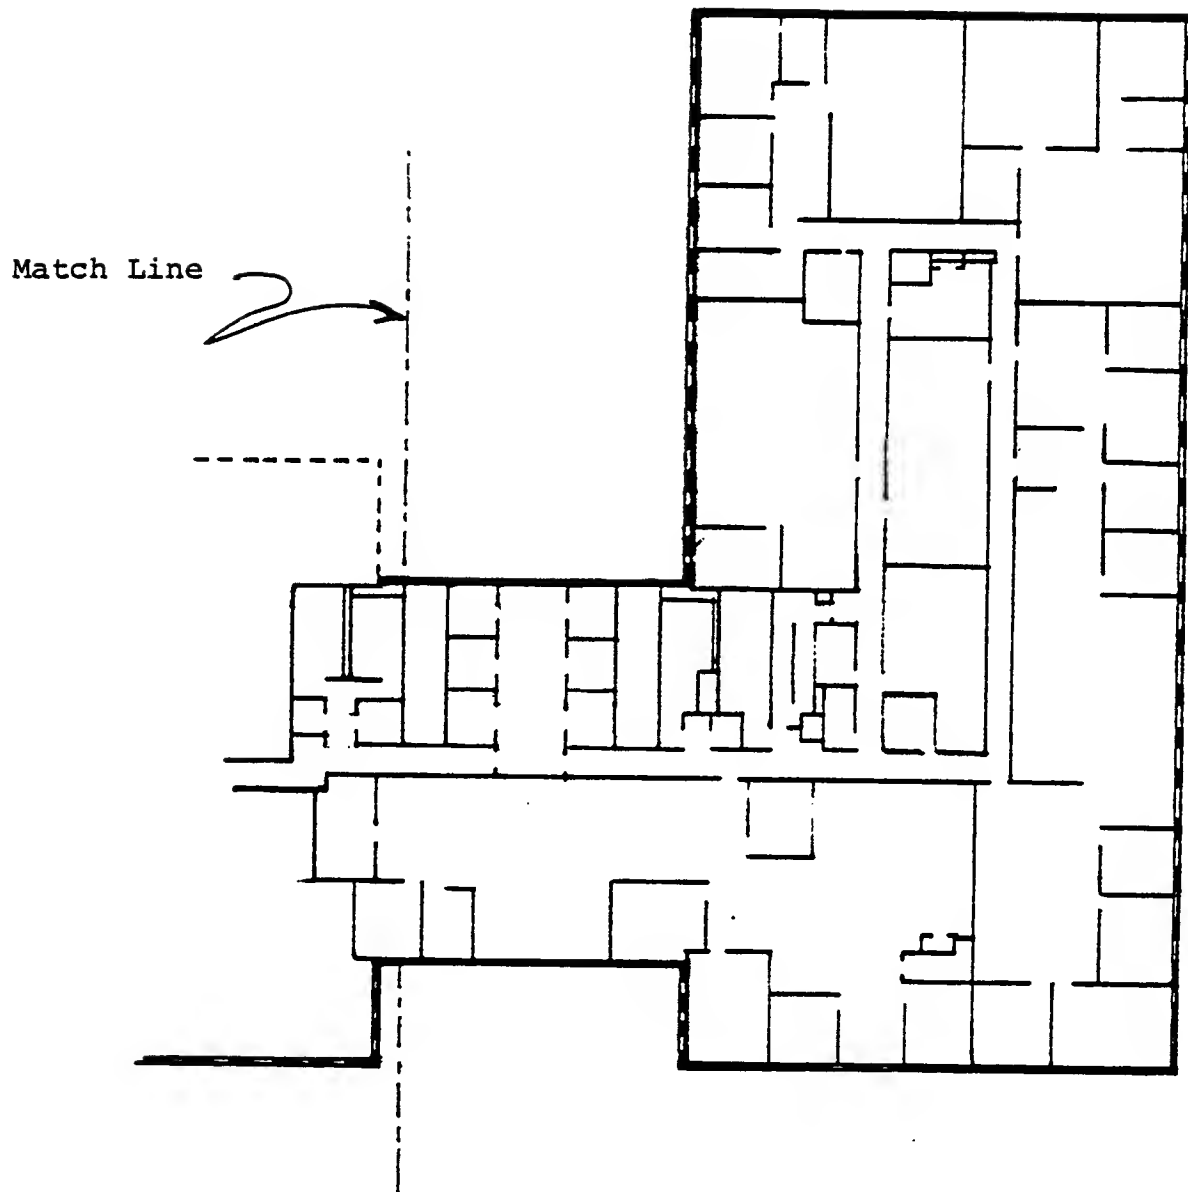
USIA BUILDING THIRD FLOOR-NORTH
